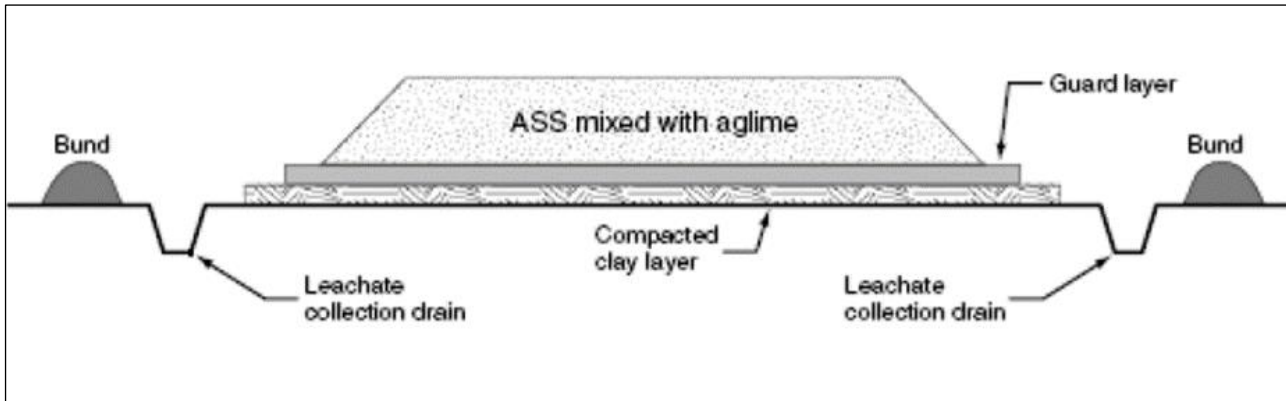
Schematic cross section of a typical treatment pad, including clay layer, guard layer, leachate collection system and containment with bunding¹
